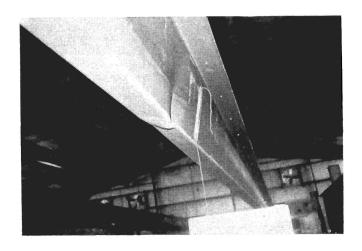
TYPICAL PURLIN FAILURE MODE
